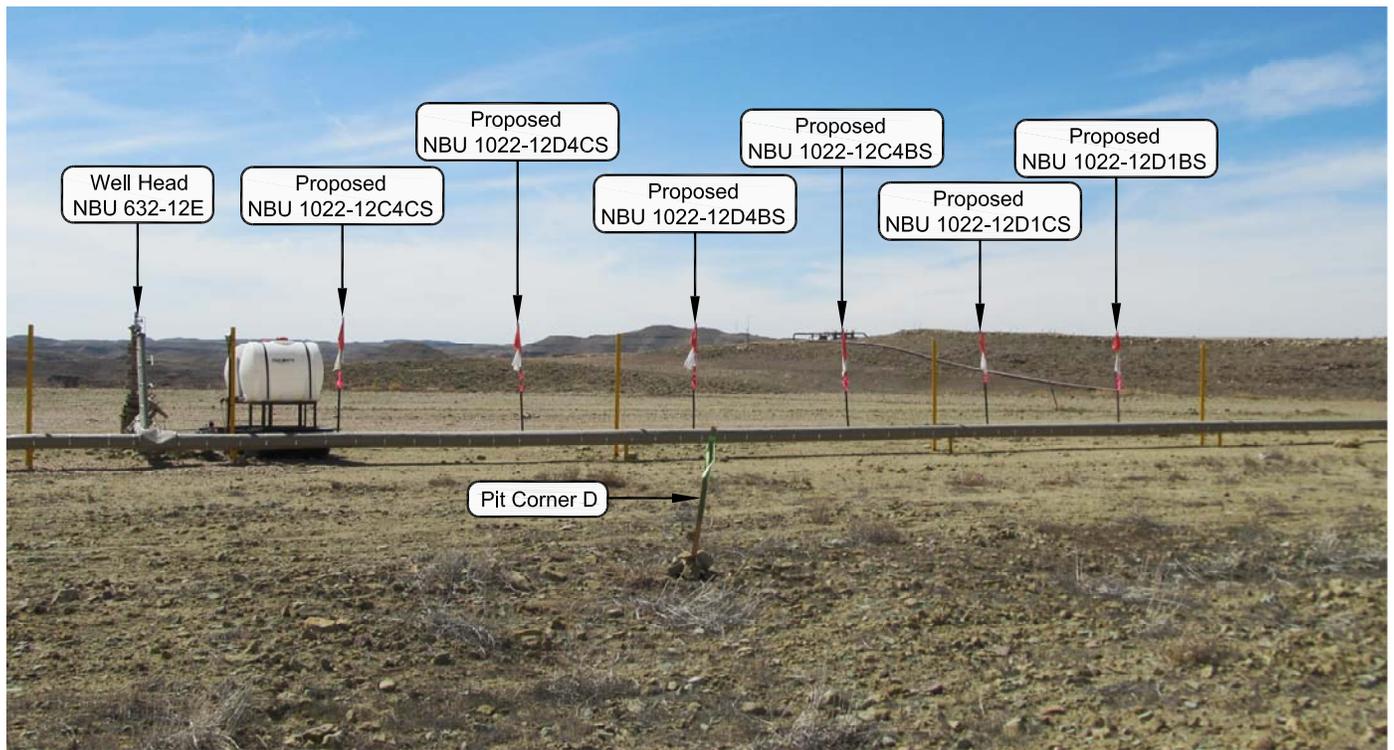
PHOTO VIEW: FROM PIT CORNER D TO LOCATION STAKE
